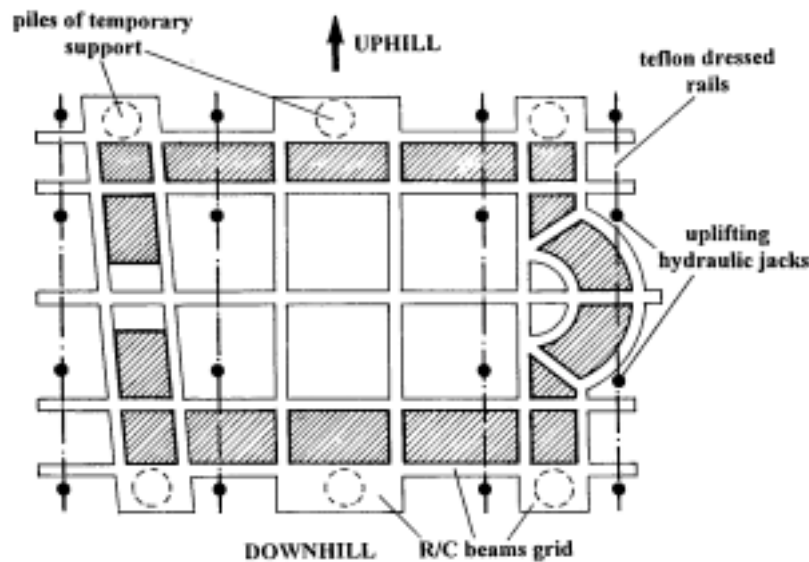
Layout of R.C. grid of beams at the foundation, arrangement of the piles, lifting jacks and tracks of sliding
